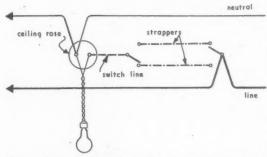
(above), axonometric drawing showing conduit for ground floor lighting points. Fig. 10 (below), circuit for two-way switching applicable to conduit.
